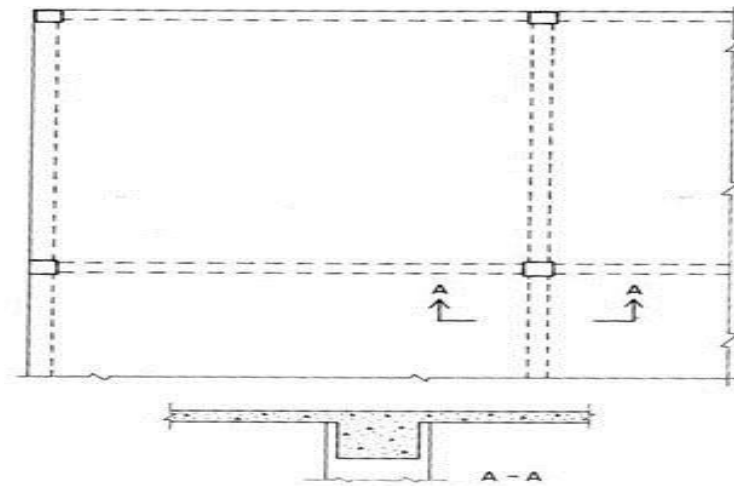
Two-way spanning concrete slab construction with edge supports
